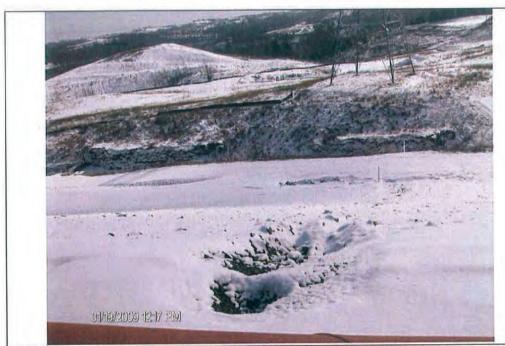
Depression up to 5' wide and 1.5' deep, Downstream slope, East embankment, looking South
